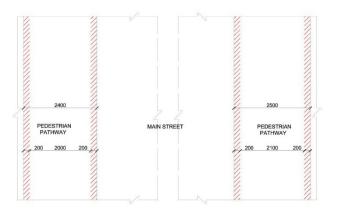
Street width and buffer spaces (in mm) for Gateway 9 in the area surrounding Offenbach am Main Hauptbahnhof
